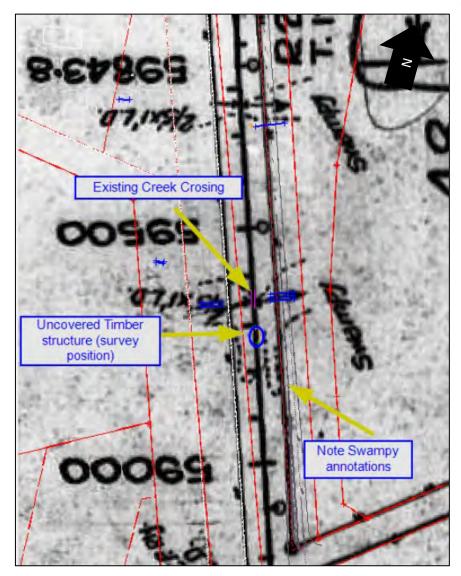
Extract from the 1937 highway upgrade plans with annotations from TMR showing the proximity of the timber structure to the creek crossing (Source: TMR, Plan No. 23752).
